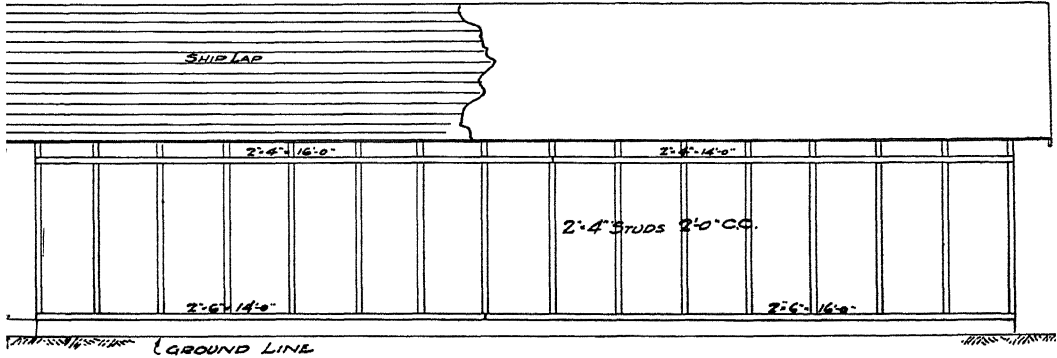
Rear framing plan. The studs are equally spaced 2 feet on center. Single plate is shown with dimensions. The windows fit in between the studs, and should be placed as shown in illustration below.
